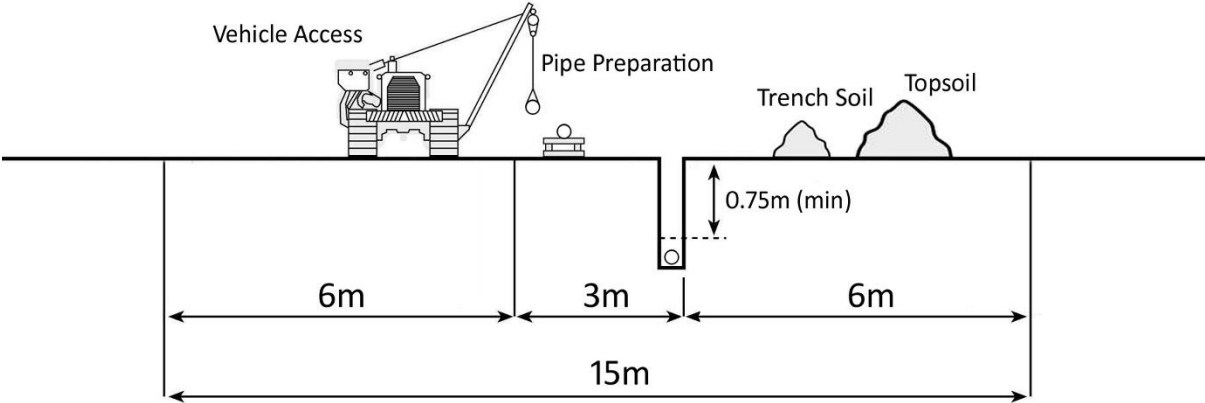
Typical layout of construction right-of-way for a small diameter pipeline
